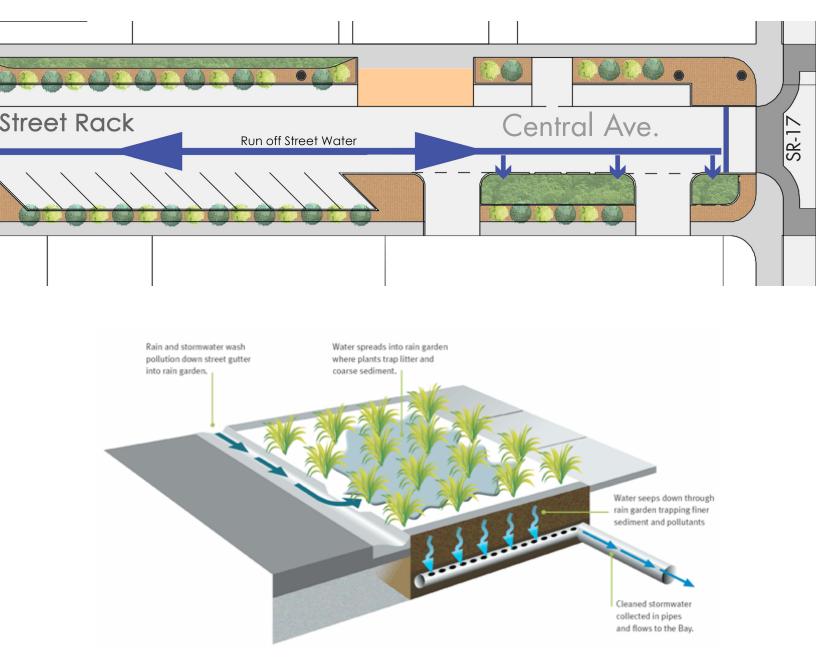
50. Street Rack Samples Figure 51. Rain Garden System Section
